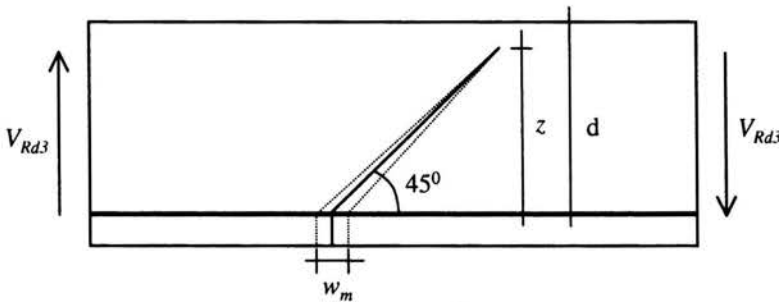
Assumed crack geometry in a beam with conventional, longitudinal reinforcement loaded to the ultimate shear loading capacity,  $V_{Rd3}$ . The crack is assumed to extend under  $45^\circ$ , and the crack opening at the re-bar is limited to  $w_m$ .
